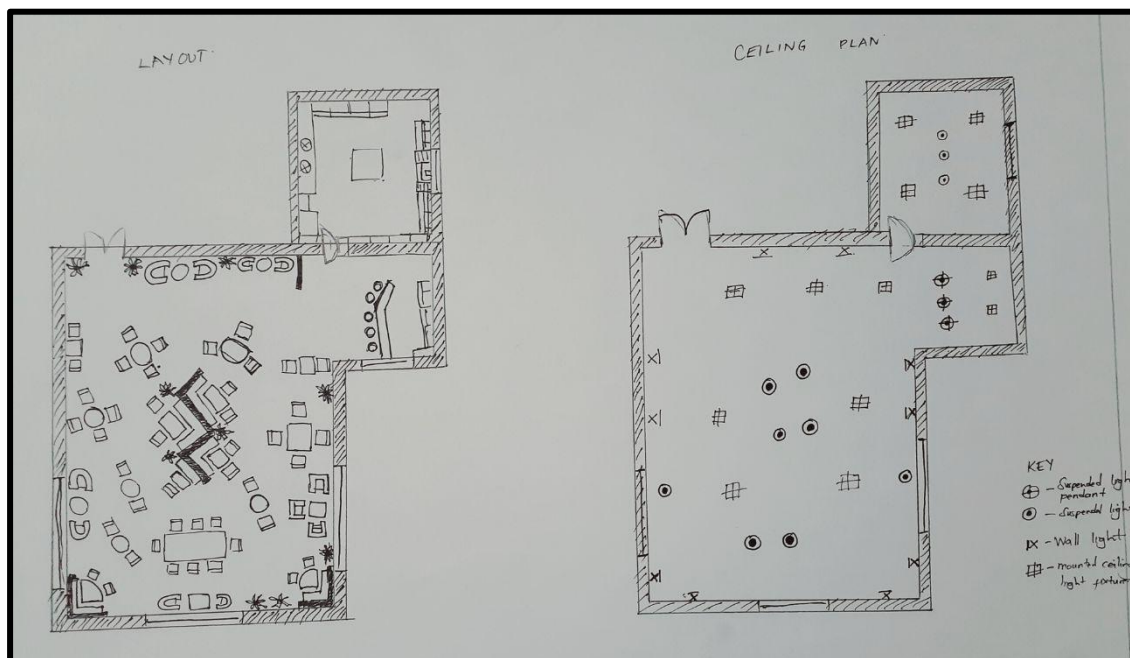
Proposed interior orthographic sketch, restaurant (Source: Author's construct, 2020)
